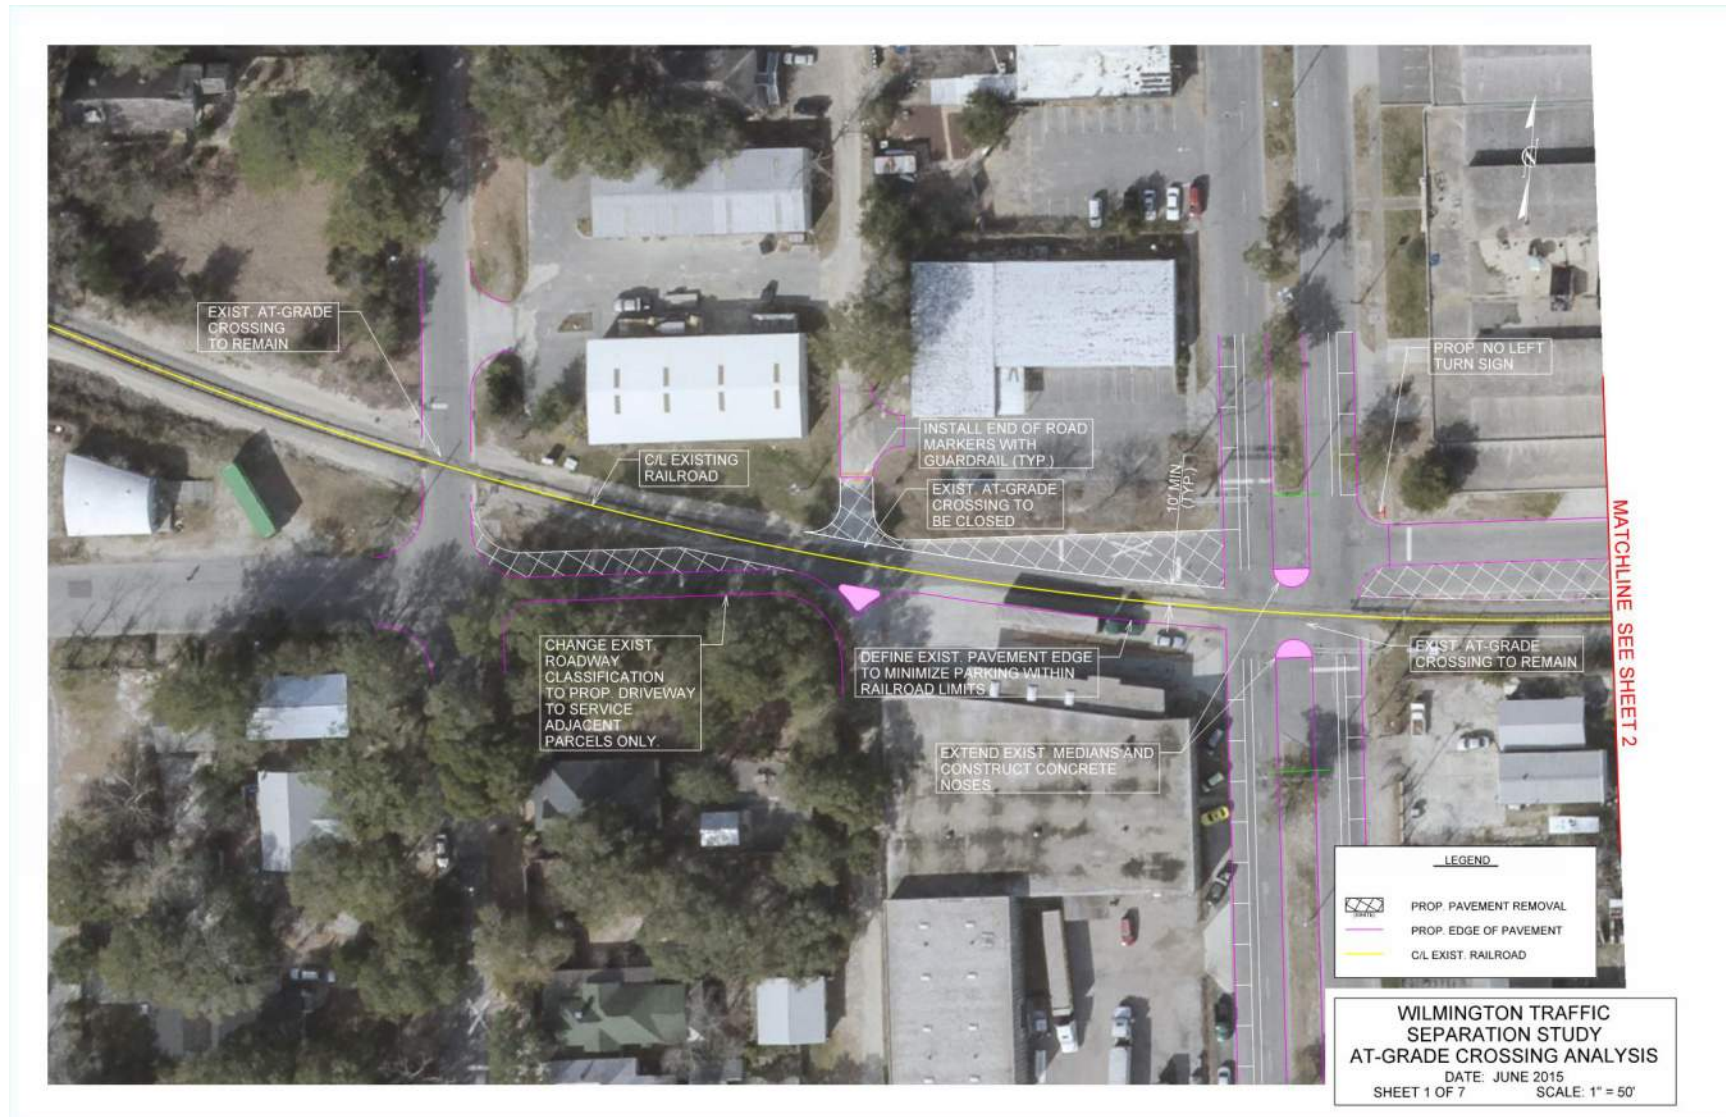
S. 4th Street / Hooper Street Alternative Recommendations
